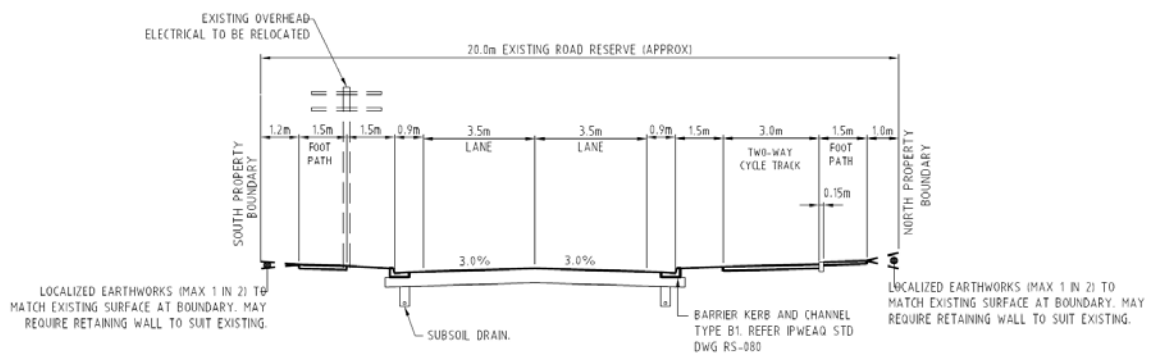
Mountain Ridge Road Typical Cross-section – Ultimate (2-lanes)
